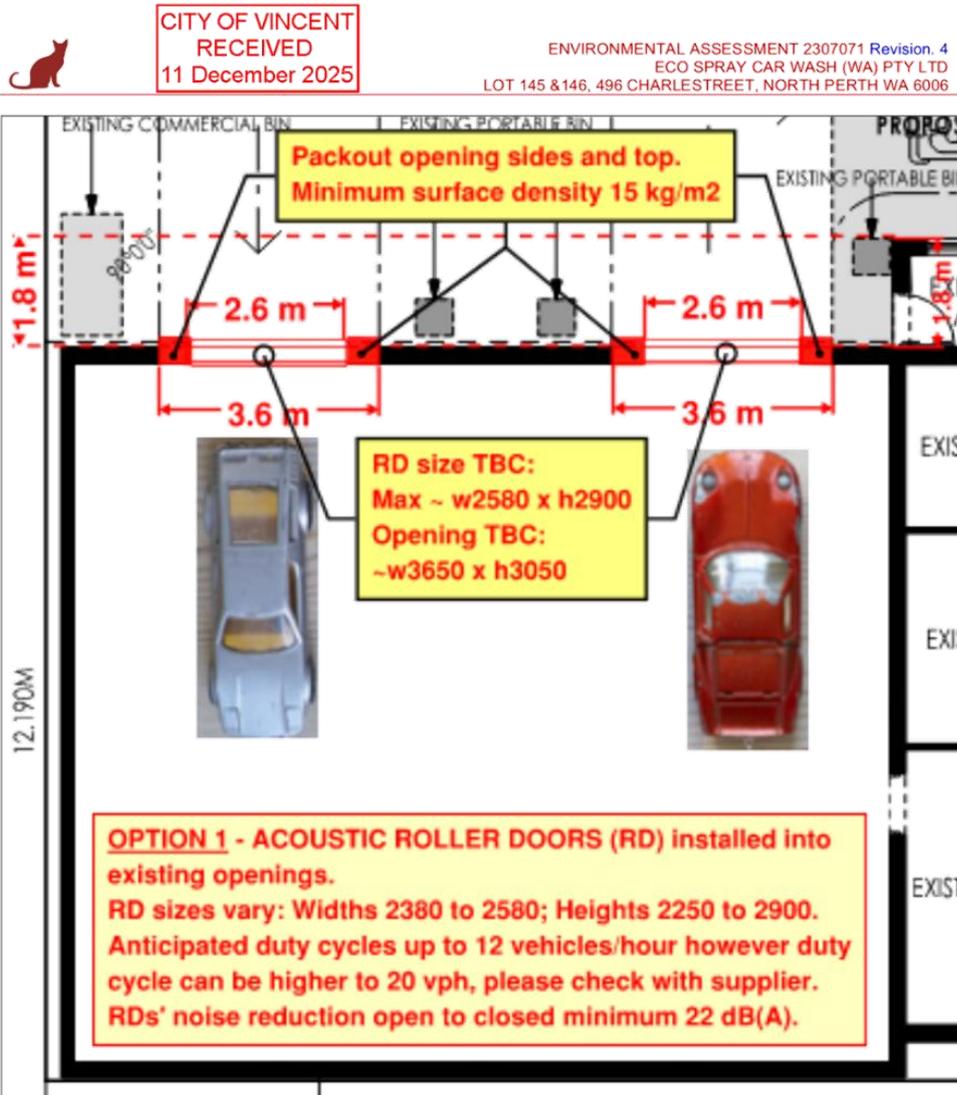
GENERAL ARRANGEMENT OPTION 1
